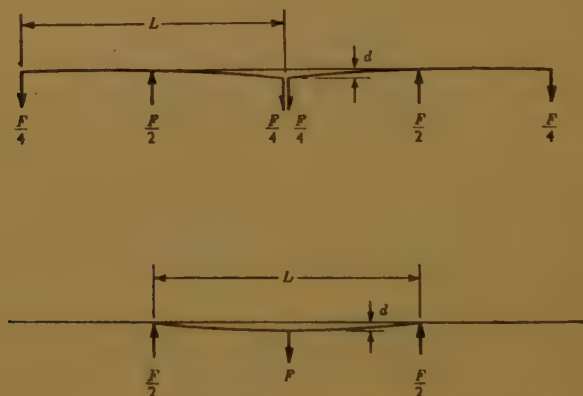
FORCES ACTING ON TIMBER DECK MEMBERS
